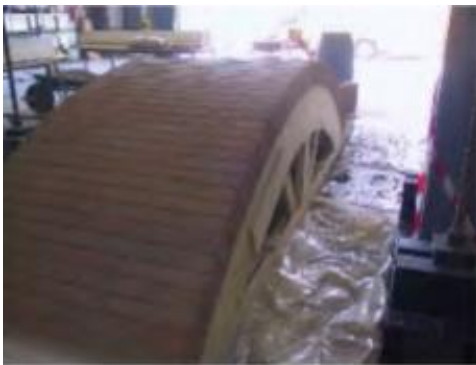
construction of ring and spandrel walls (Serna, J., 2001).
